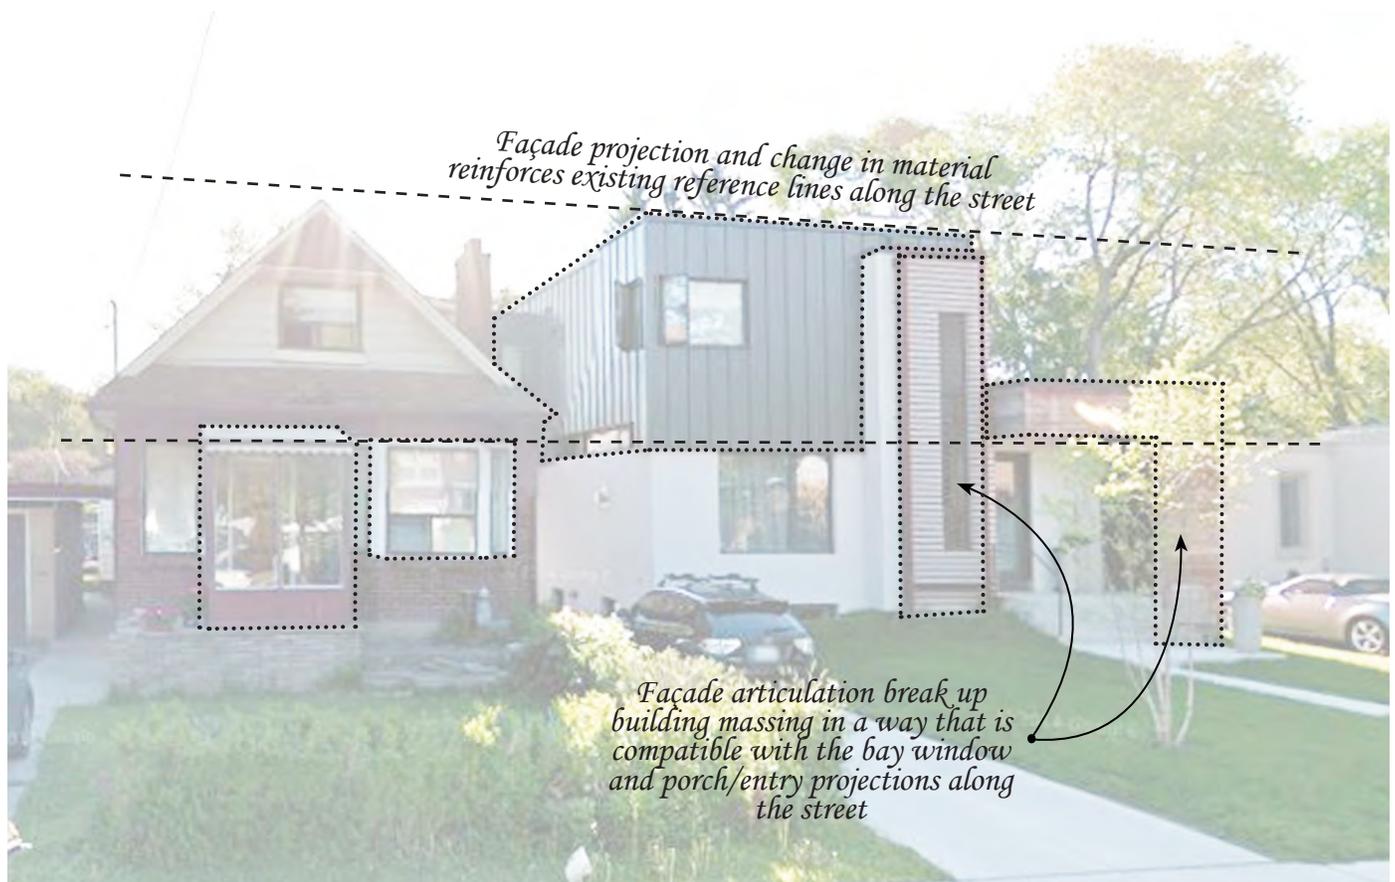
Compatible articulation of the façade breaks up building massing and reinforces existing reference lines along the street
